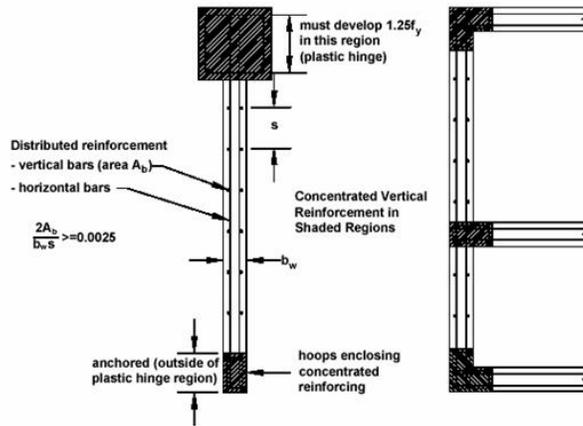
Distributed Reinforcement and Concentrated Reinforcement
